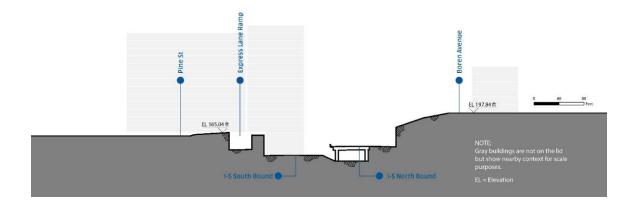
Area 3: Existing Cross Section between Pine Street and Olive Way
